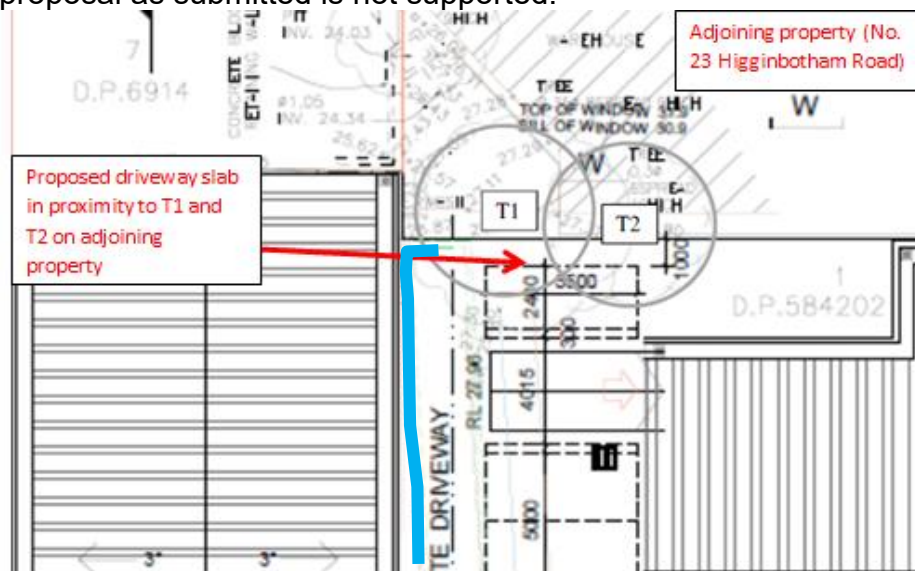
Location of trees on subject site and adjoining properties that may be affected by proposal (proposed stormwater infrastructure shown in blue)
